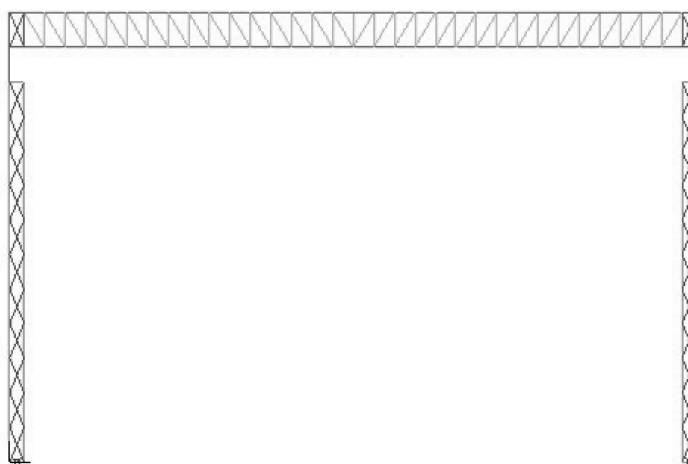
Typical industrial frame with truss beam and discontinuous in elevation laced members
